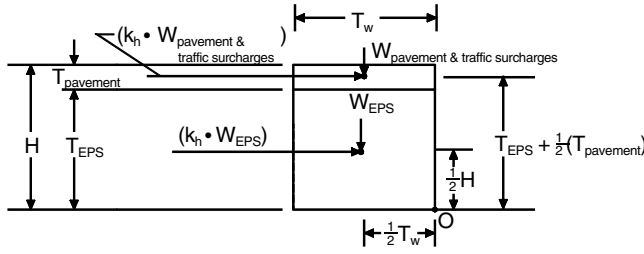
Variables for determining the factor of safety against overturning of a vertical embankment due to pseudo-static horizontal forces used to represent an earthquake loading.
